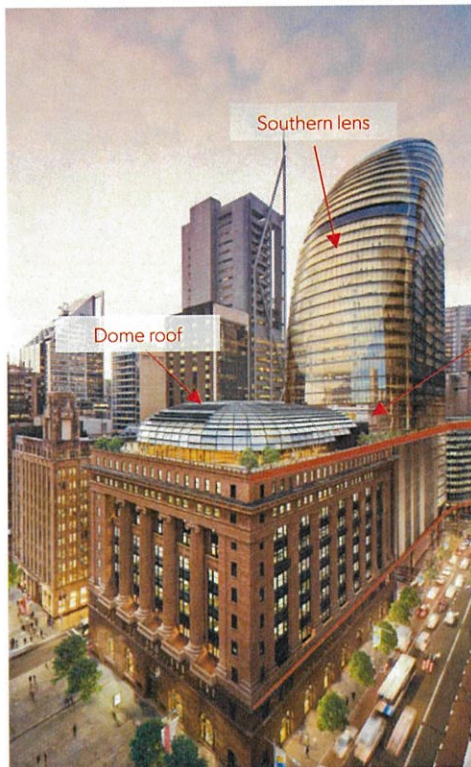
| Photomontage illustrating the Tower curves away from dome roof of 50 Martin Place (Source: Applicant's RtS)
